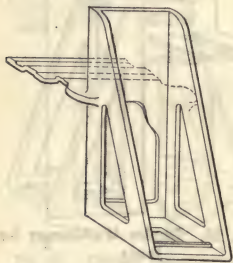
Duplex Wall-hanger for Concrete Blocks
